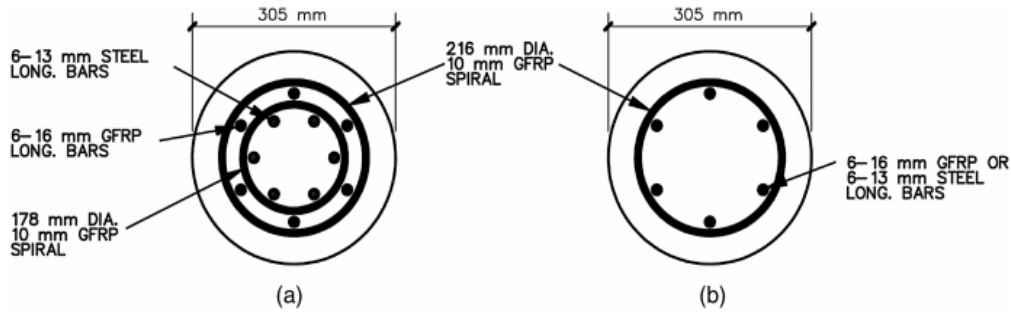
Reinforcement configuration of concrete columns: (a) type DB-double layer; (b) type SS and SG-single layer (Hales et al. 2016).
